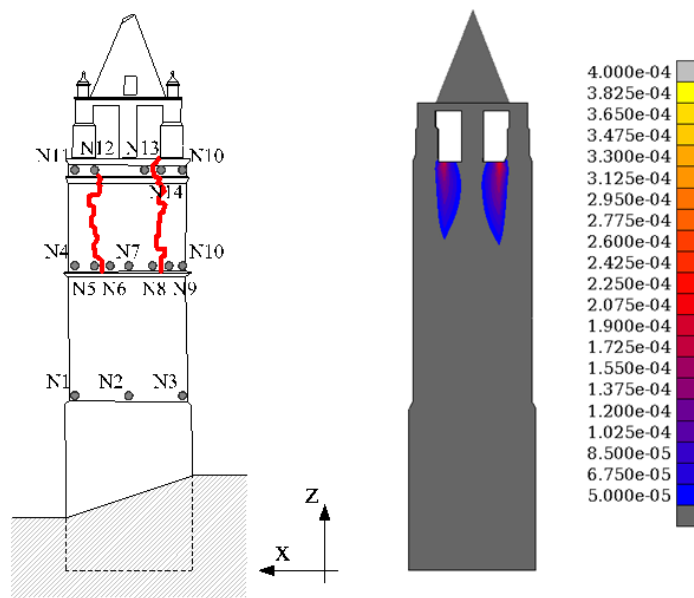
Mogadouro tower North façade, surveyed (on the left) and numerical (on the right) cracking pattern.
